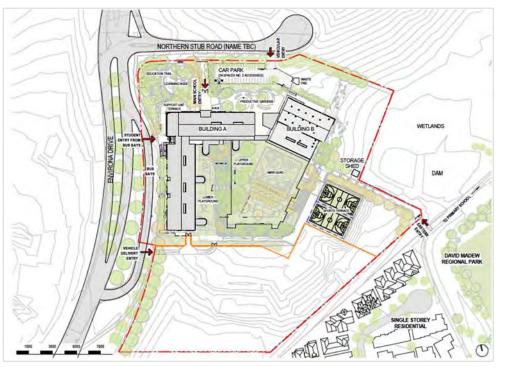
JHS Proposed Site Plan (Source: TKD Architects)
